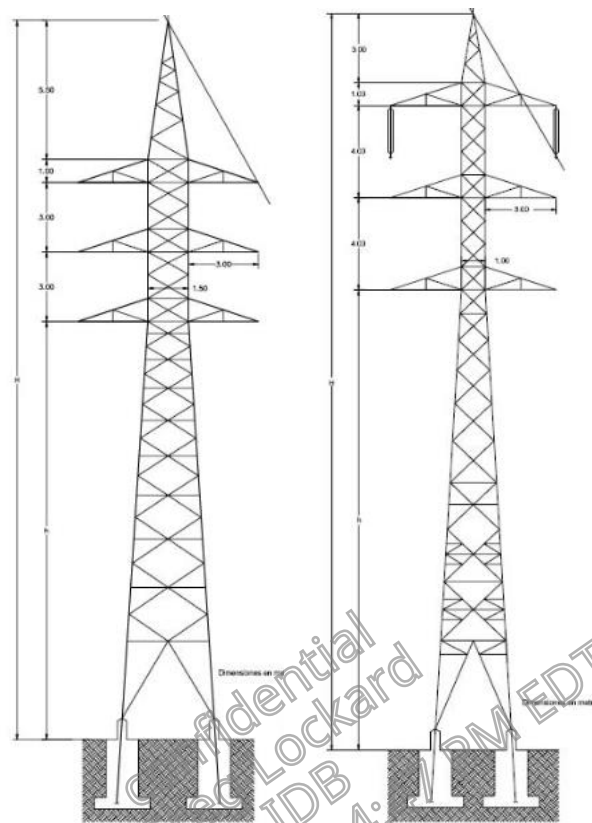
Indicative elevation view of a cross section of different types of steel towers for the suspension of transmission lines and their foundations.
